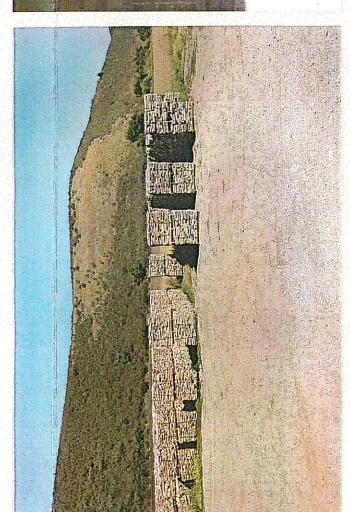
AREA FOR INSTALLING CHICKEN WIRE & STEEL BANDS
